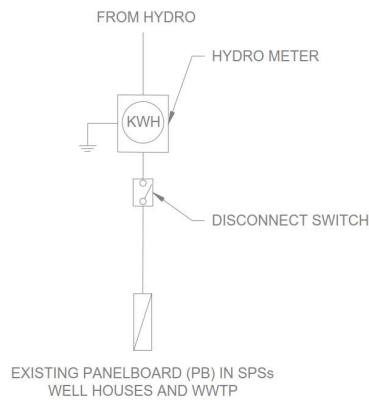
Existing electrical typical installation of Mini Lakes recreational centre, water and sewage facilities
